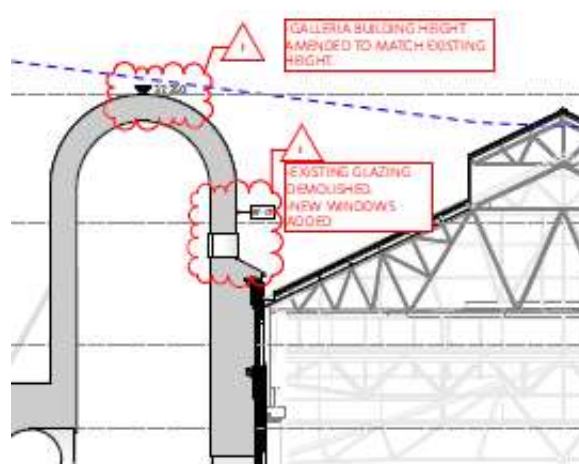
Proposed location of high-level glazing as part of the approved external and internal cladding. (Source: DBJ Architects)
